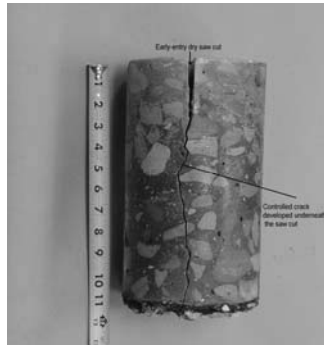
Controlled crack developed underneath the narrow transverse contraction joint at test section S2 established using the early entry dry saw cut method.
